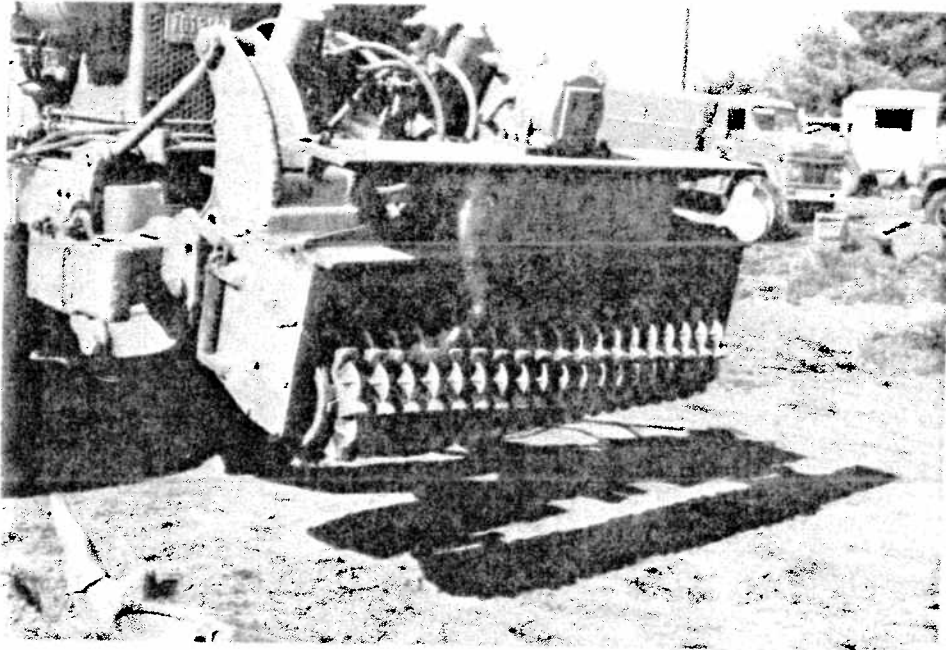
Grader Rear-Mounted Rotating Mill with Optional Vibratory Engine
